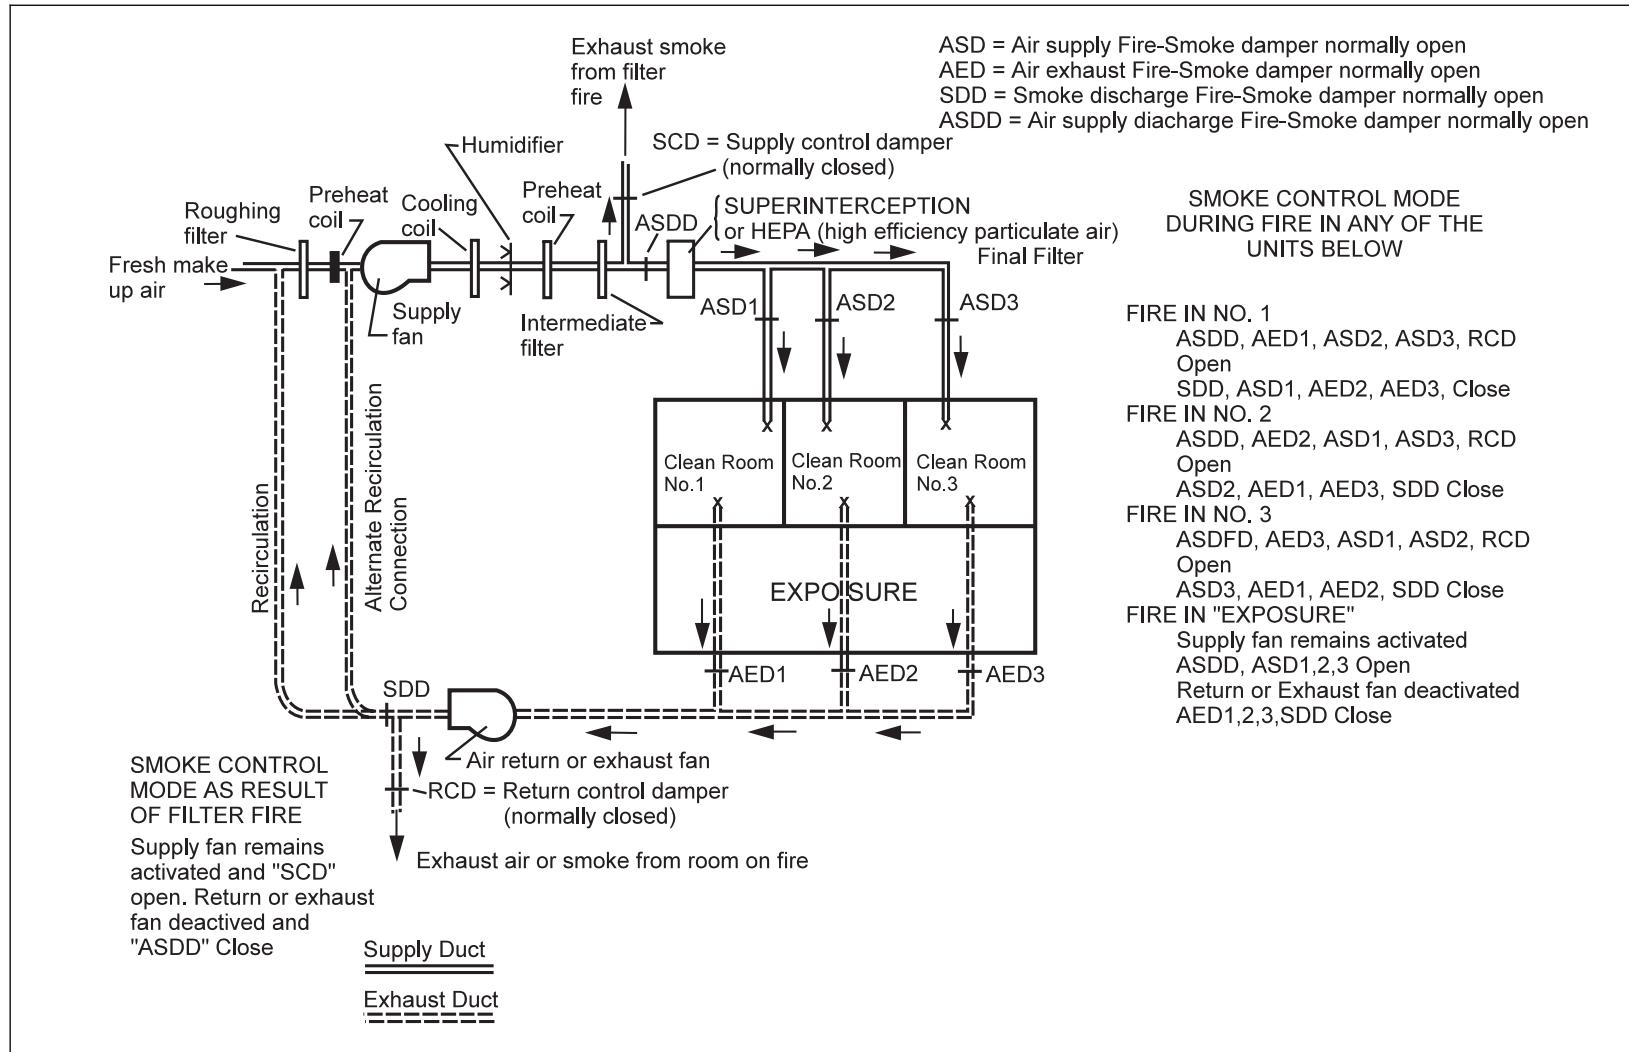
Typical smoke control arrangement when a central air handling system is used to serve cleanrooms.
